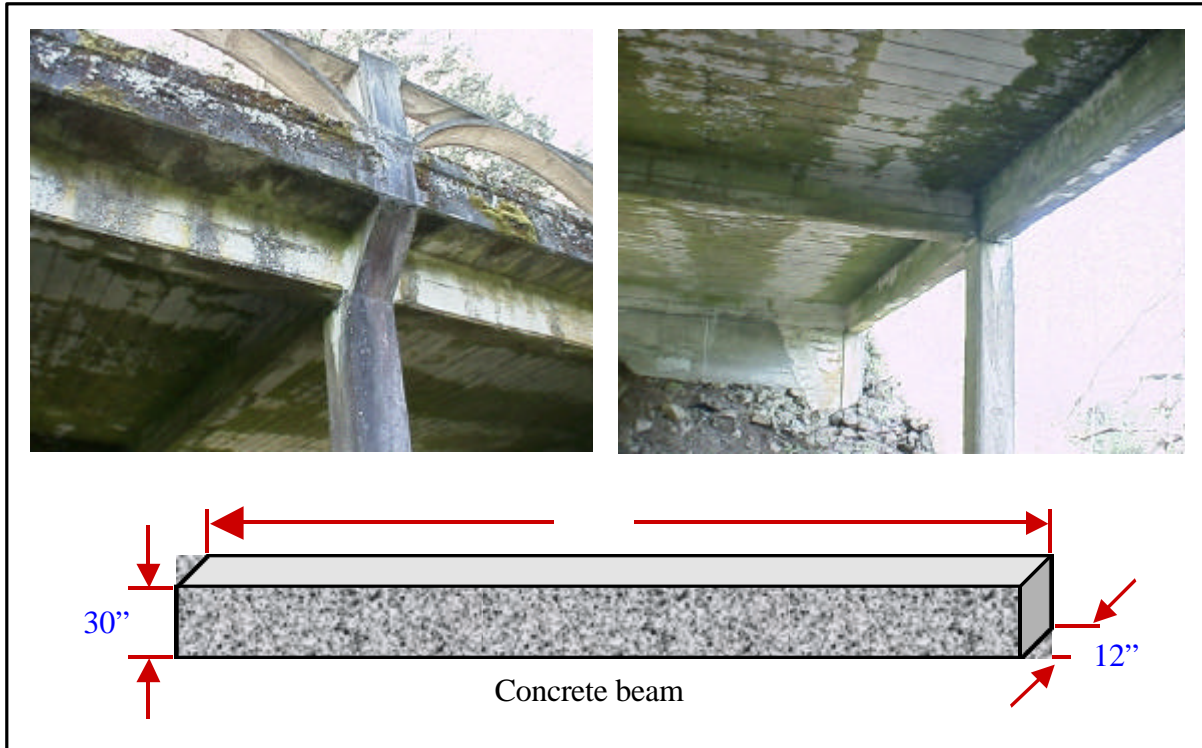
Concrete test beams are to be instrumented and tested in the laboratory prior to reinforcing the bridge.
